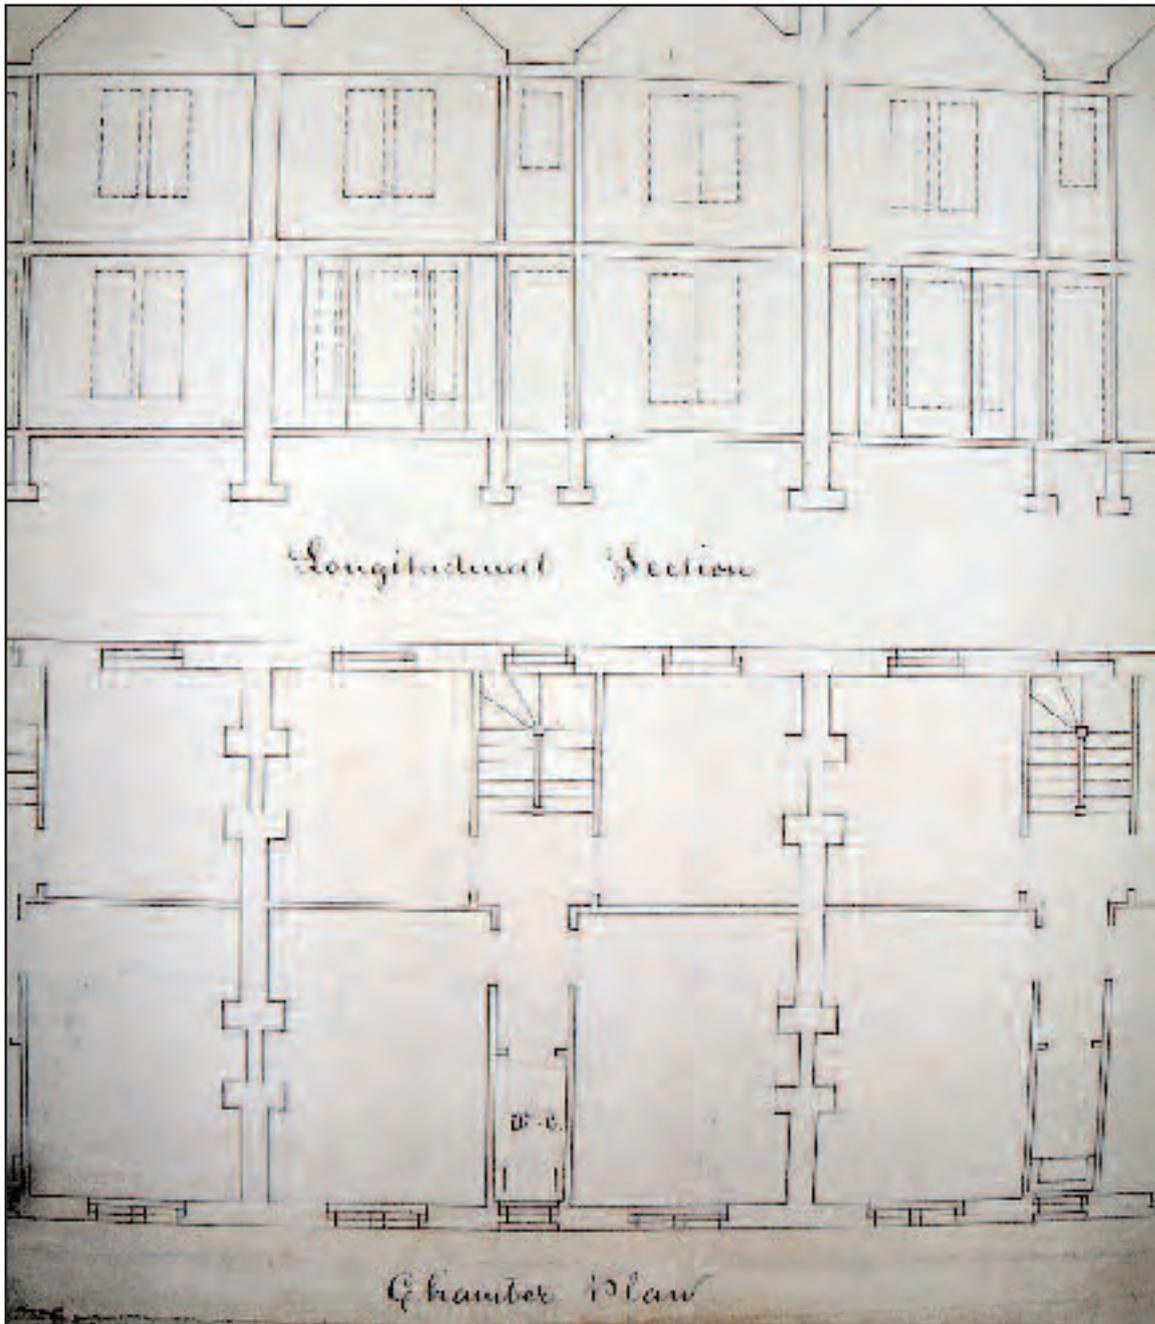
First floor & longitudinal section, 21-25 St Michael's Park, 1873
